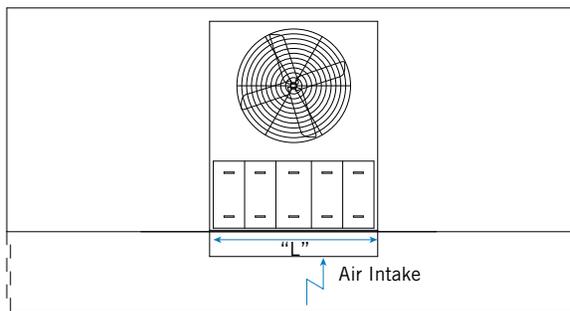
Plan View of Single Air Inlet Unit with Alternate Louver Arrangement
